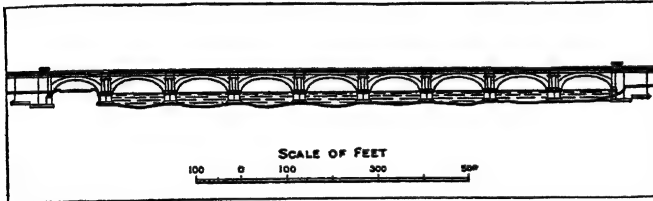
STONE BRIDGES: WATERLOO BRIDGE, RENNIE'S MASTERPIECE, LONDON, COMPLETED IN 1817. IT CONSISTS OF 9 ARCHES EACH OF 120 FT. SPAN
